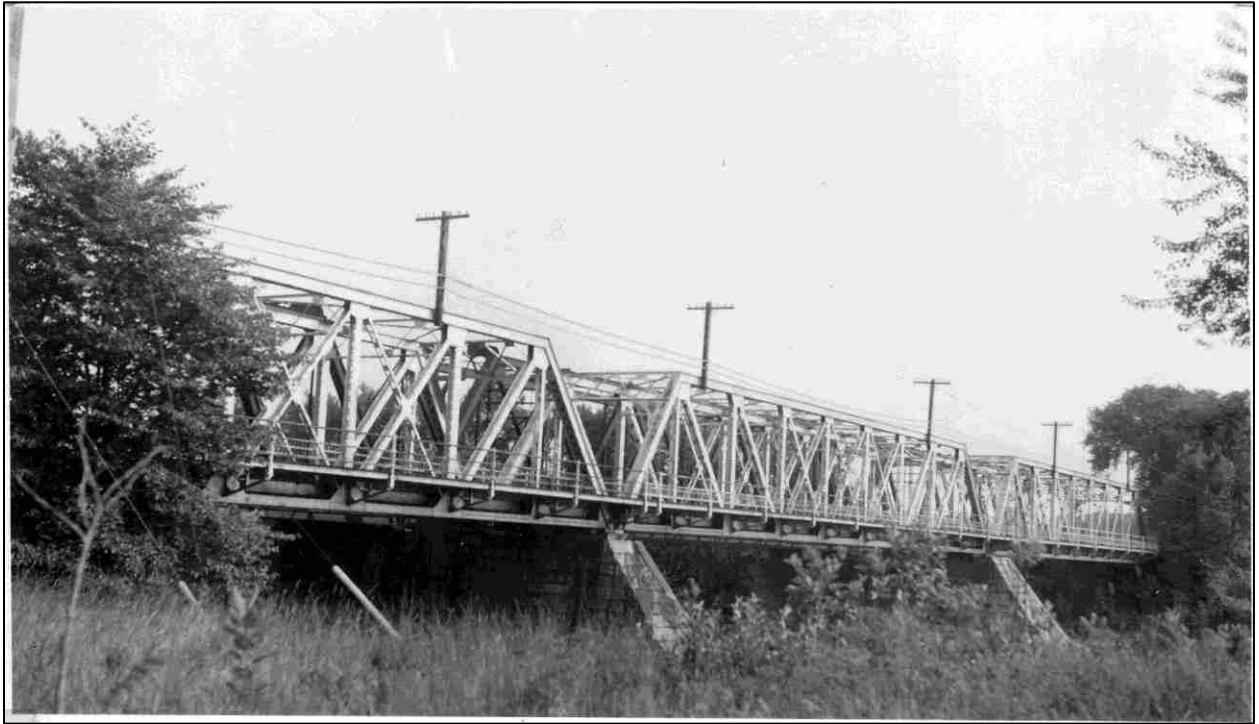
Federal Bridge, built 1915, showing upstream side. Photo c. 1940. Boston & Maine Railroad Bridge just visible behind. This bridge was replaced by the US 93 bridge in 1959 (NHDOT bridge card Concord 136/115, no date on card, c. 1940).
